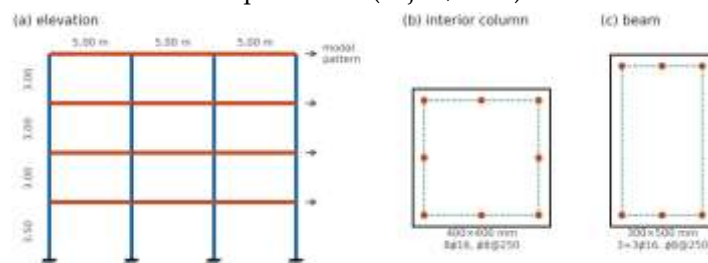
Case-study frame: (a) elevation with the modal lateral load pattern; (b) interior column section; (c) beam section. Storey heights and bay widths in metres.
